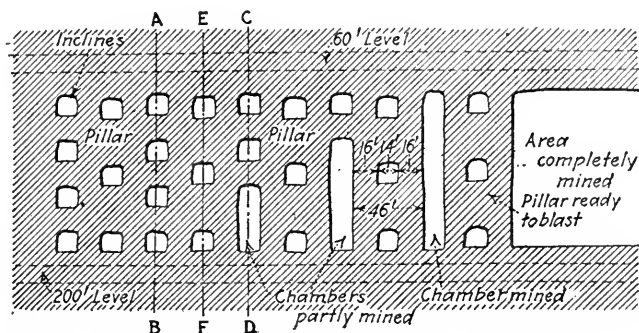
IDEAL LONGITUDINAL SECTION OF DEVELOPED OREBODY SHOWING ALTERNATING PILLARS AND CHAMBERS.
